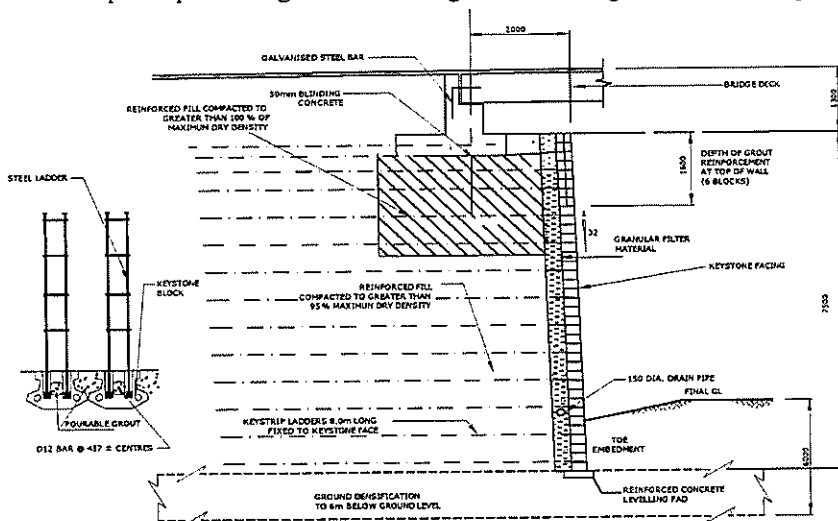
Tahuna Bridge Steel Ladder Reinforced Abutment with KeyStone Facing
